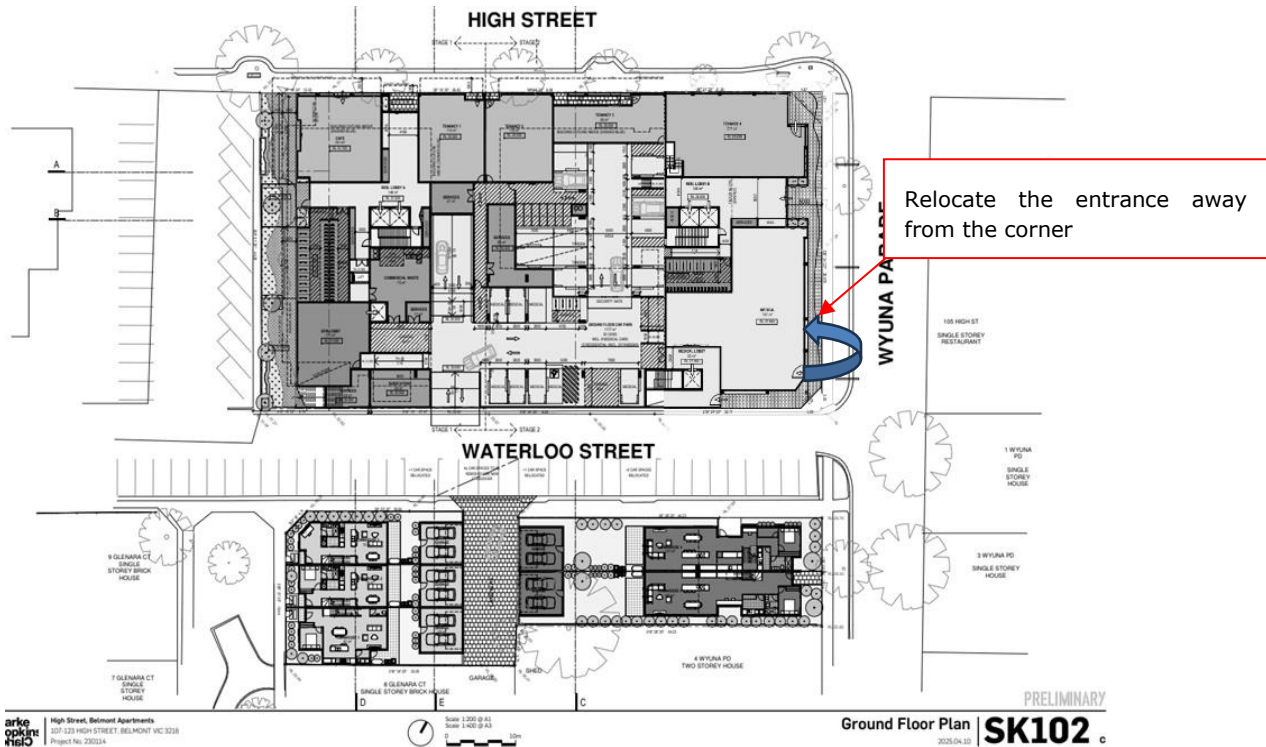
ground floor plan with the recommended wind control measures overlaid.
